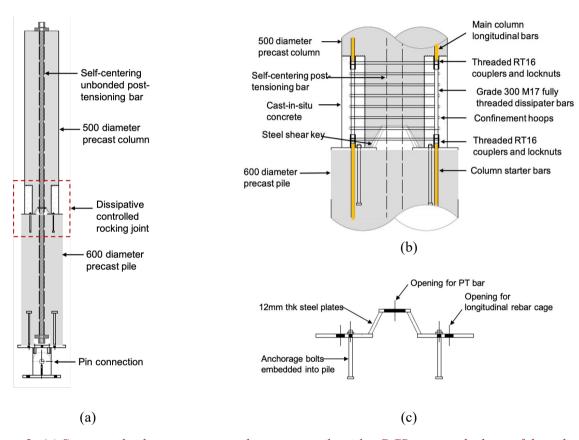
(a) Specimen bridge pier supported on a monopile with a DCR joint at the base of the column. (b) DCR connection detail. (c) Steel shear key.
